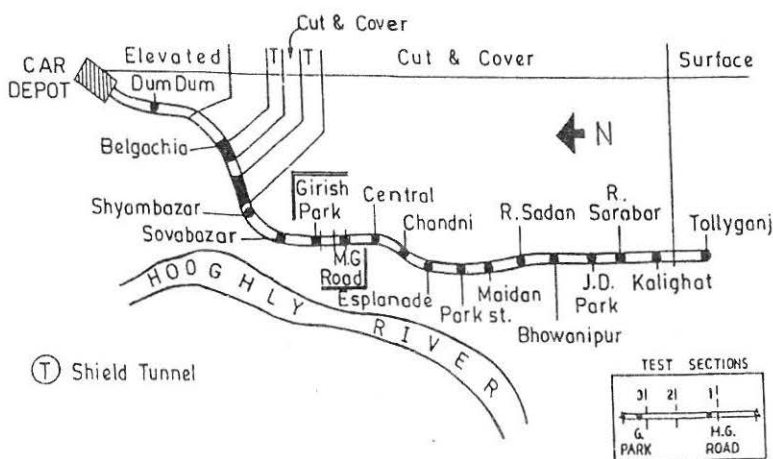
Calcutta Metro Cut – Location of Instrumented Test Sections between Girish park and M.G. Road Stations
